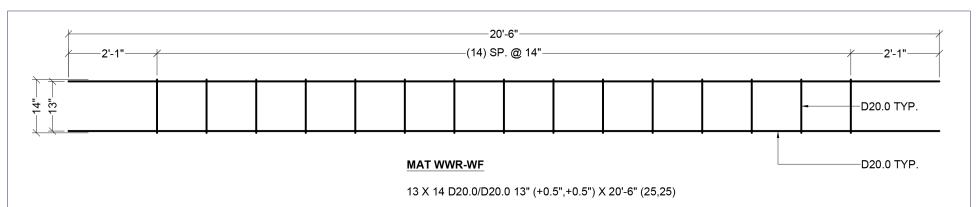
Representation of WWR for wall footing. Note the spacing indicated for the longitudinal wires is shown a total of one inch less than that which was specified in order to accommodate a minimum production "overhang" of one-half inch on each side (as dictated by the needs of the welding machines). One alternative that many manufacturers might elect to pursue in lieu of running such a narrow mat is to run a wider mat with a repeating pattern of longitudinals spaced at 14" on center. This mat would then be shop-sheared into several narrow mats satisfying the specified spacing of the longitudinal reinforcement and would simultaneously eliminate any protruding nominal overhangs.
